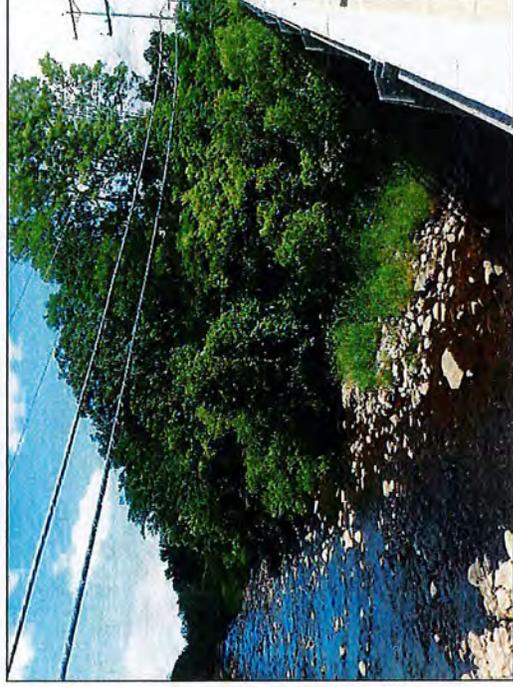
Bemis Road: View of heavy vegetation and shoaling.
